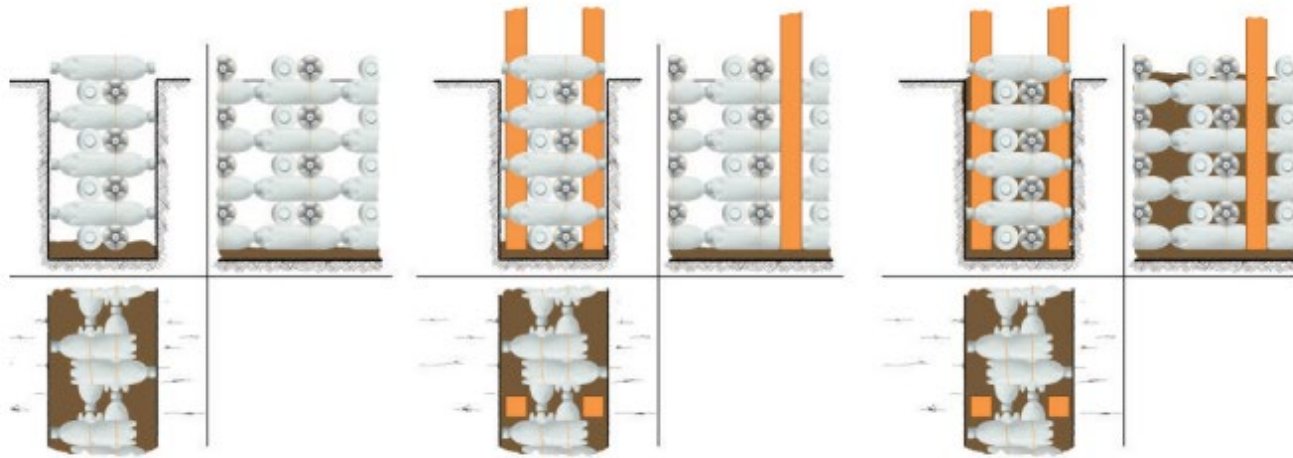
Proposed construction method: Design choices; Construction of the base of the wall.
